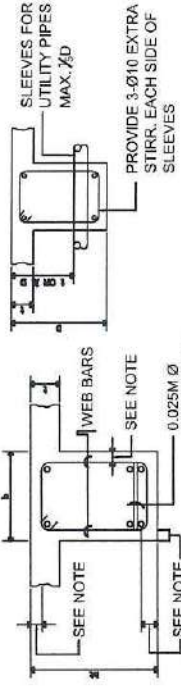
TYP. DET. FOR SLEEVES THRU CONCRETE BEAM AND GIRDERS
